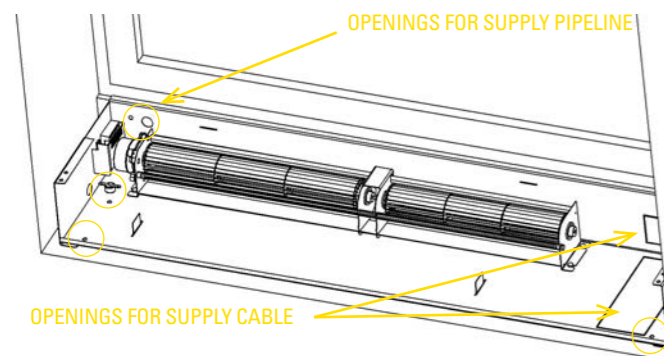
Remove the window sill panel and grilles. Remove the heat exchanger and fit the convector into position. Mark the convector mounting holes and the position of the pipes and power supply cable. The mounting holes can be located at the bottom or at the back of the convector.
